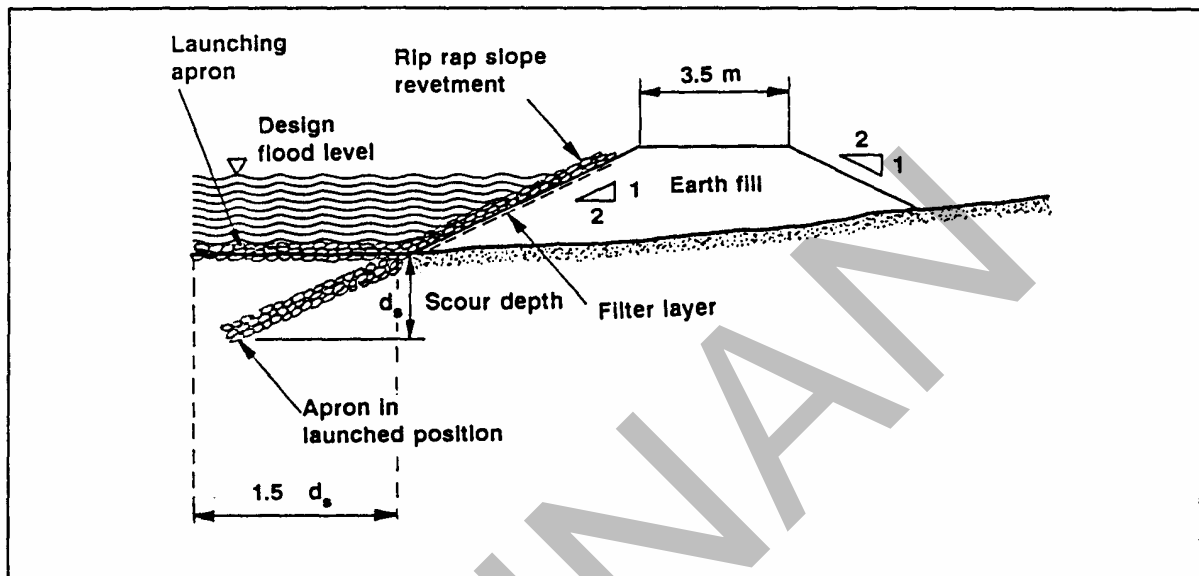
Typical Guide Bank with Riprap Protection and Launching Apron
